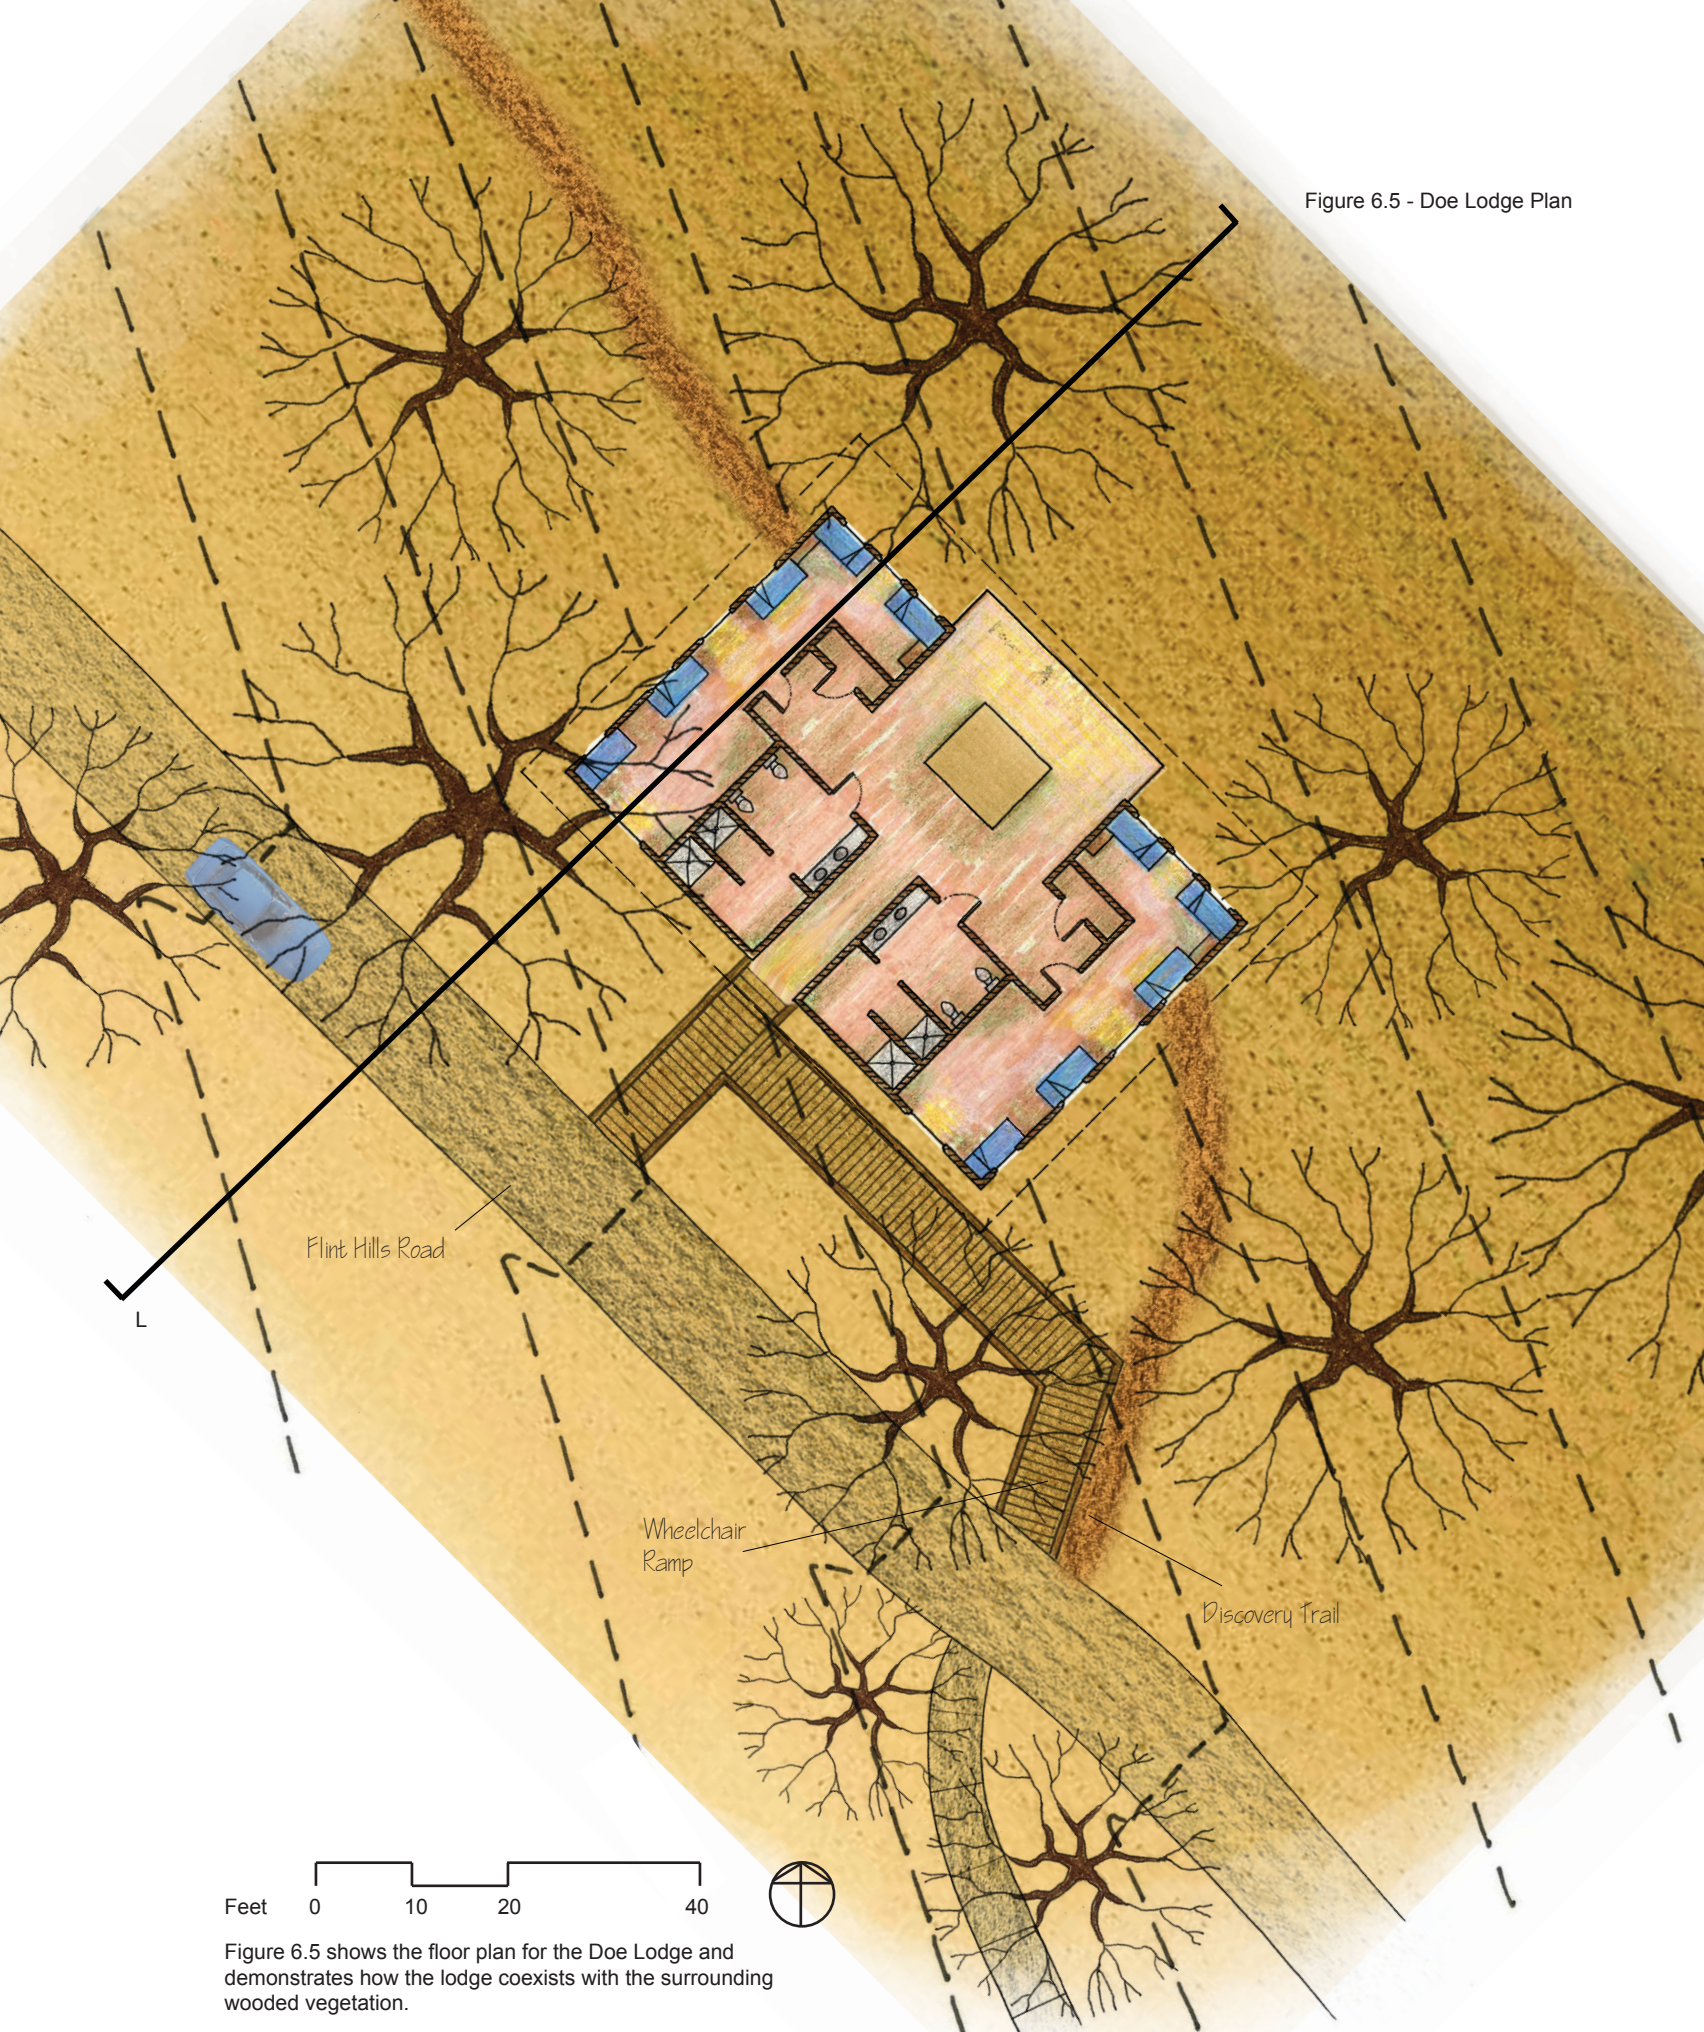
shows the floor plan for the Doe Lodge and demonstrates how the lodge coexists with the surrounding wooded vegetation.
